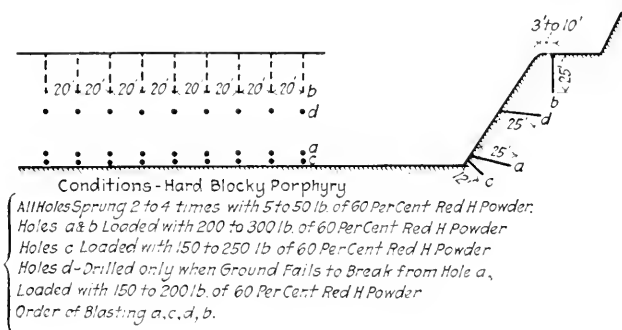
Drilling and blasting 70-ft. bank; tripod drilling.
